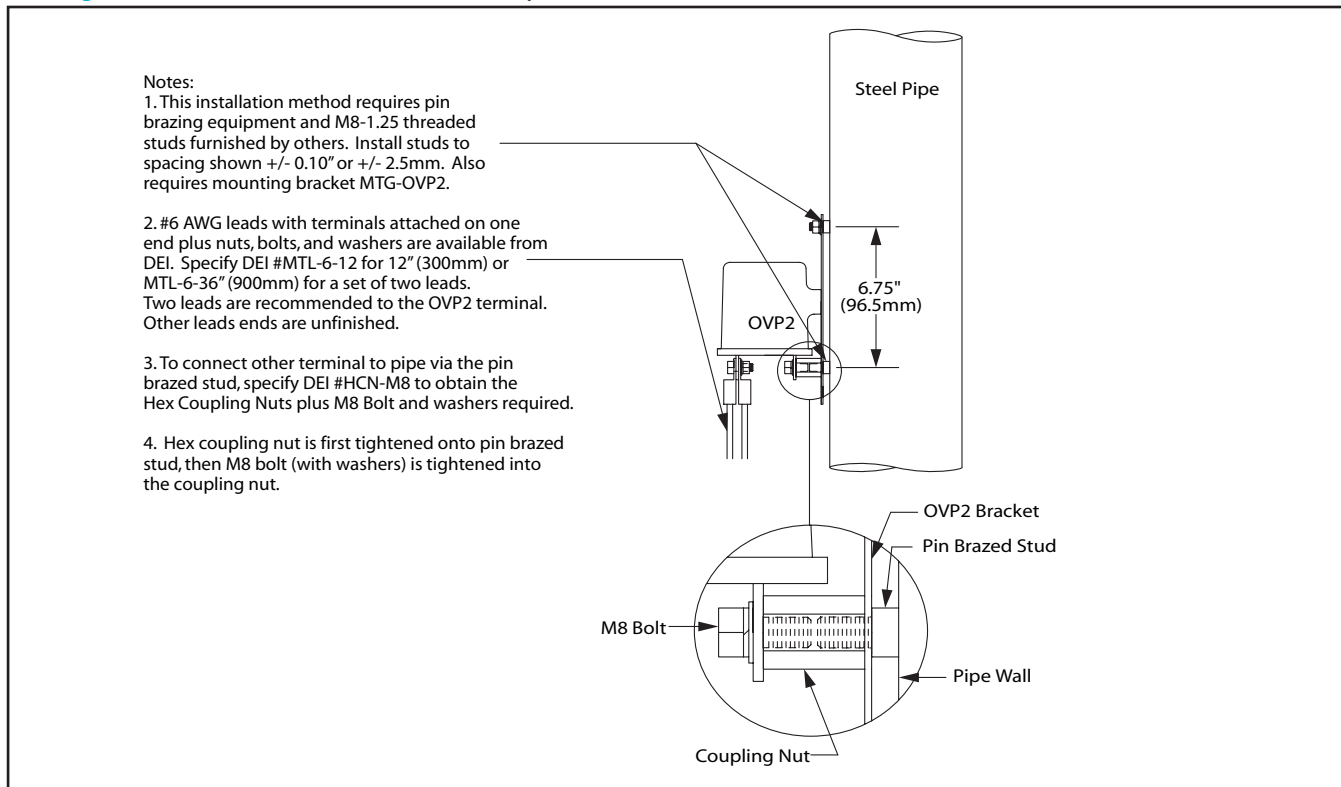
Flange Mount Using Tapped Holes or Pin Brazed Studs
